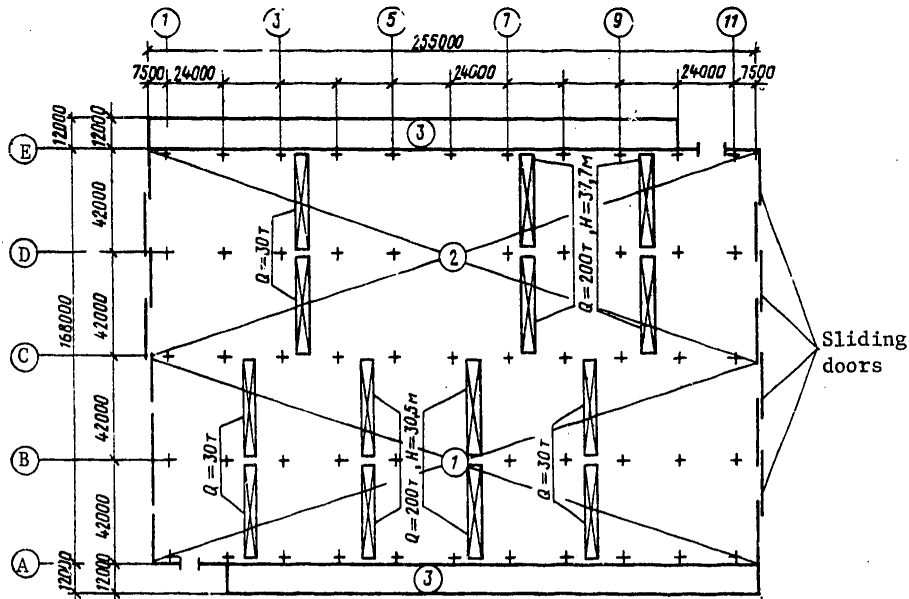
Layout of shipbuilding sheds of Class II shipyards. 1--module construction shops; 2--shipbuilding shed; 3--installation and outfitting sections of the shops, auxiliary and general services facilities (multistory annex).
